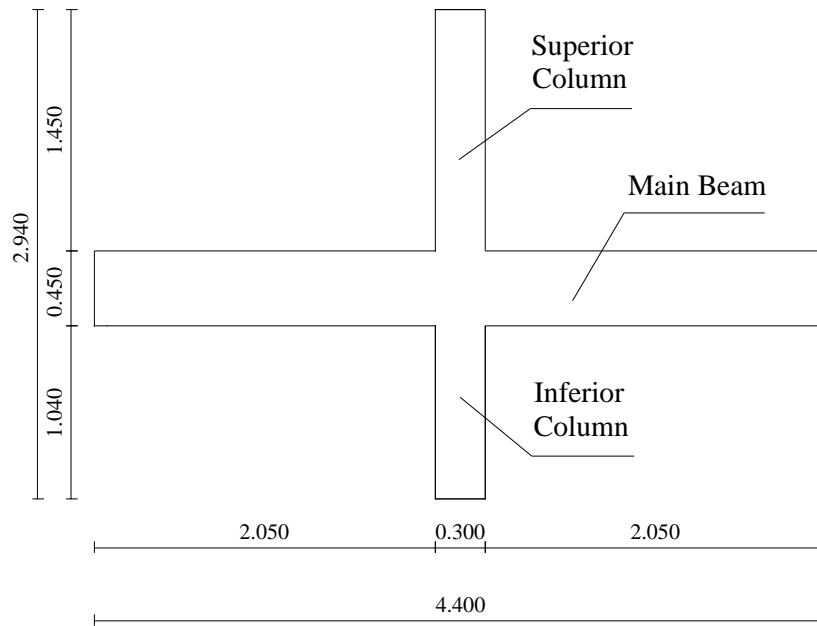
Beam-column joint specimen without slab and transverse beams (dimensions in m).
